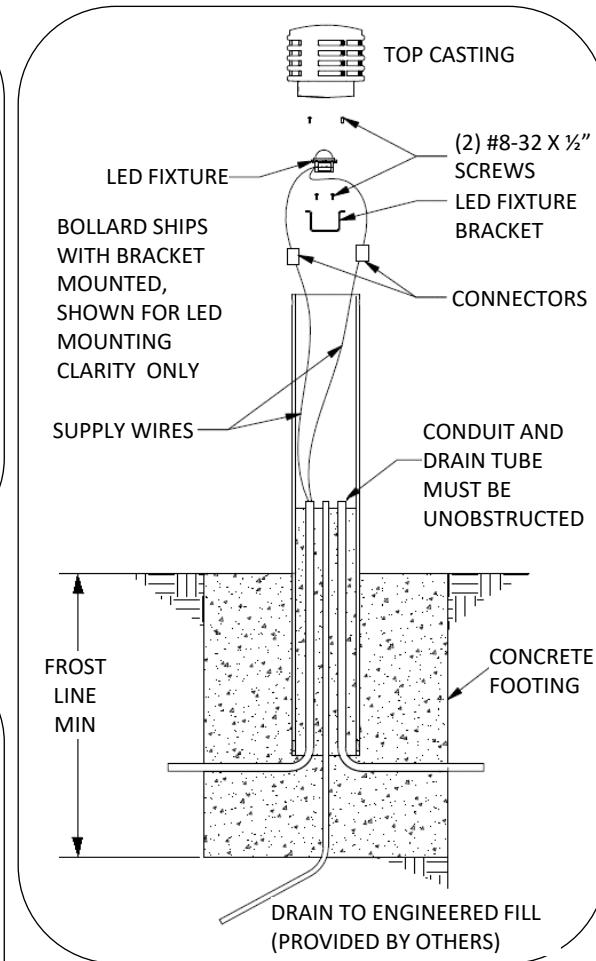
ALTERNATE FOOTING DETAIL FOR EMBEDDED BOLLARD WITH LOW VOLTAGE LIGHT
